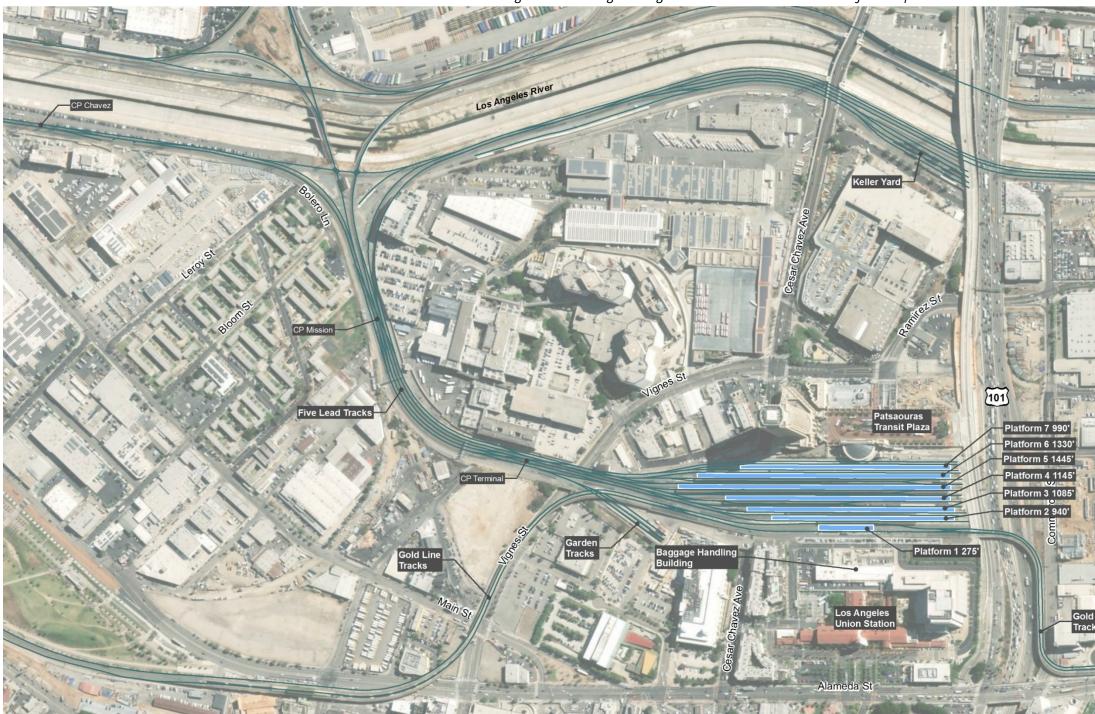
Existing Los Angeles Union Station Track and Platform Layout
